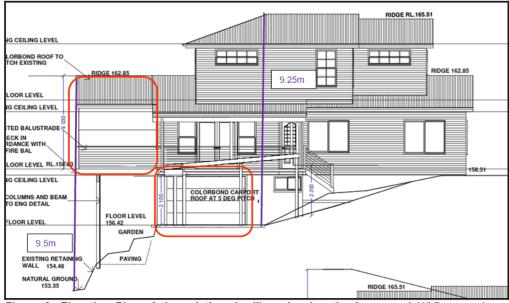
Elevation Plan of the existing dwelling showing the 2 areas of HOB exceedance (purple lines) and the 2 areas of the proposed works (red rectangles)
